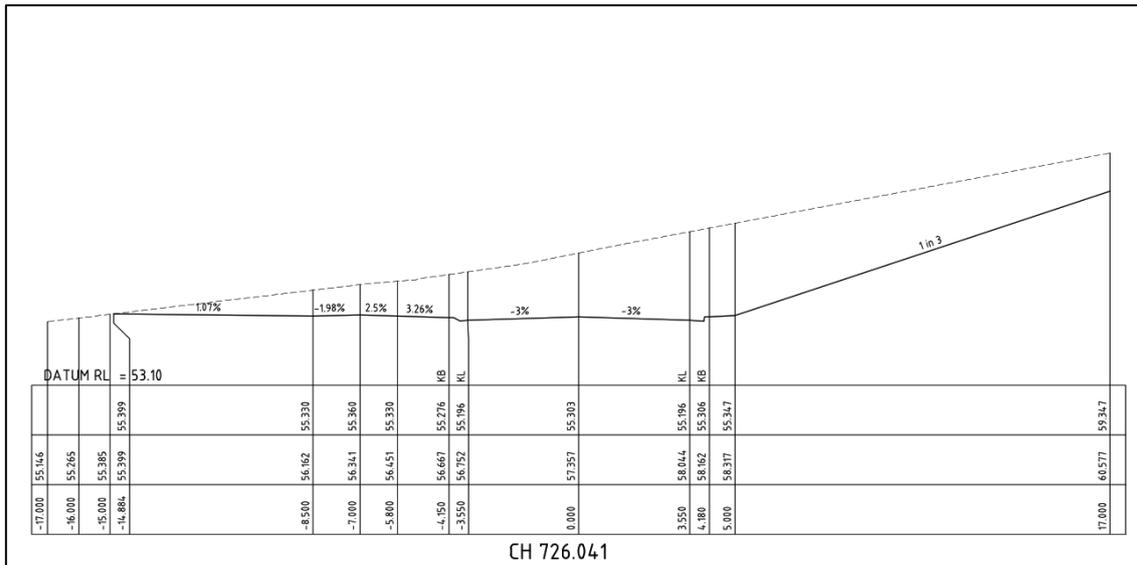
Overview at Ch 726.041 Baiyang Crescent
